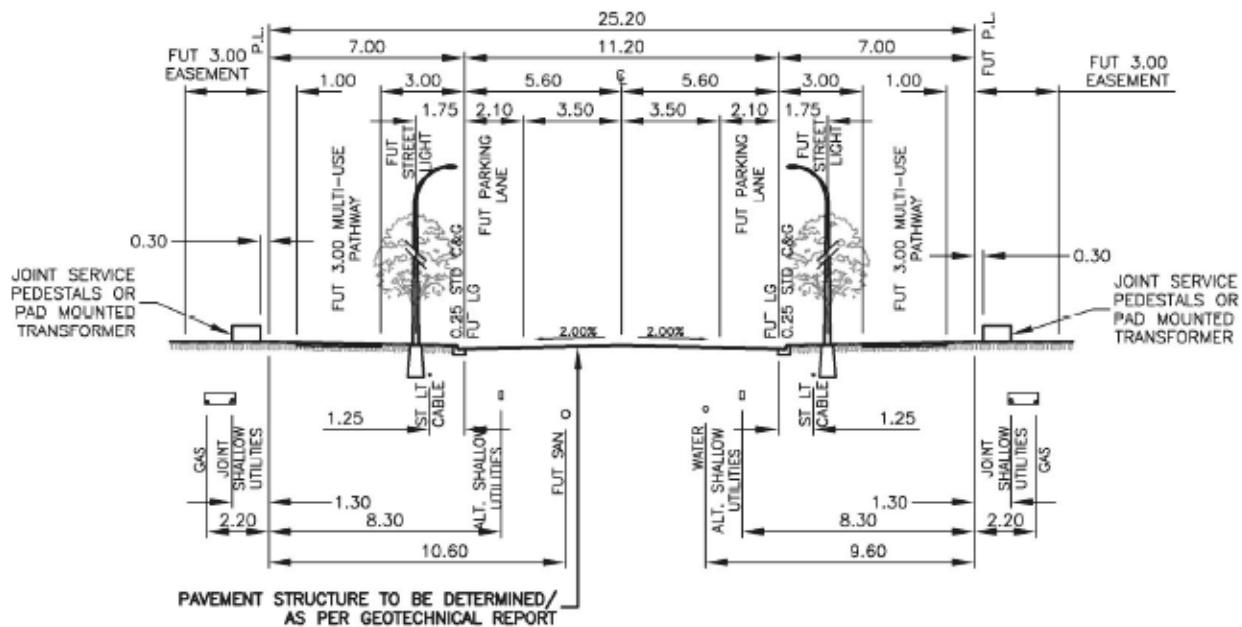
Recommended Cross-Section (Collector Street with Parking on Both Sides)
